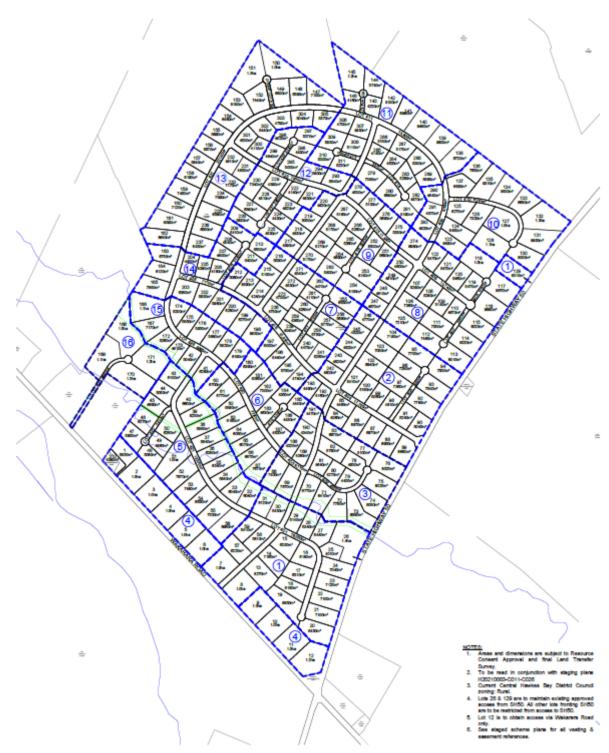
Subdivision Scheme and Staging Plan. Source: Development Nous 9 November 2021.
